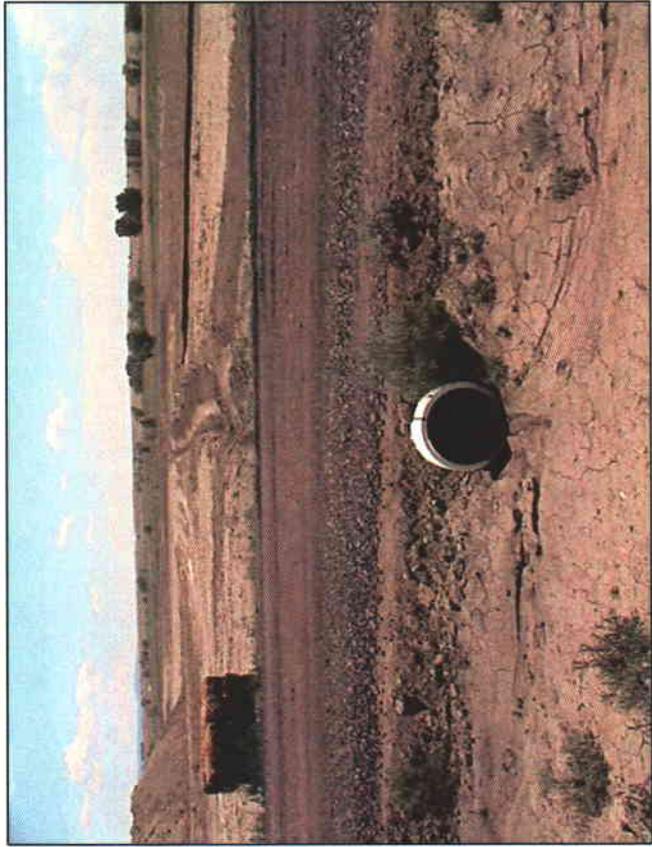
Storm Water managed on site using drainage channels and culvert pipes.
